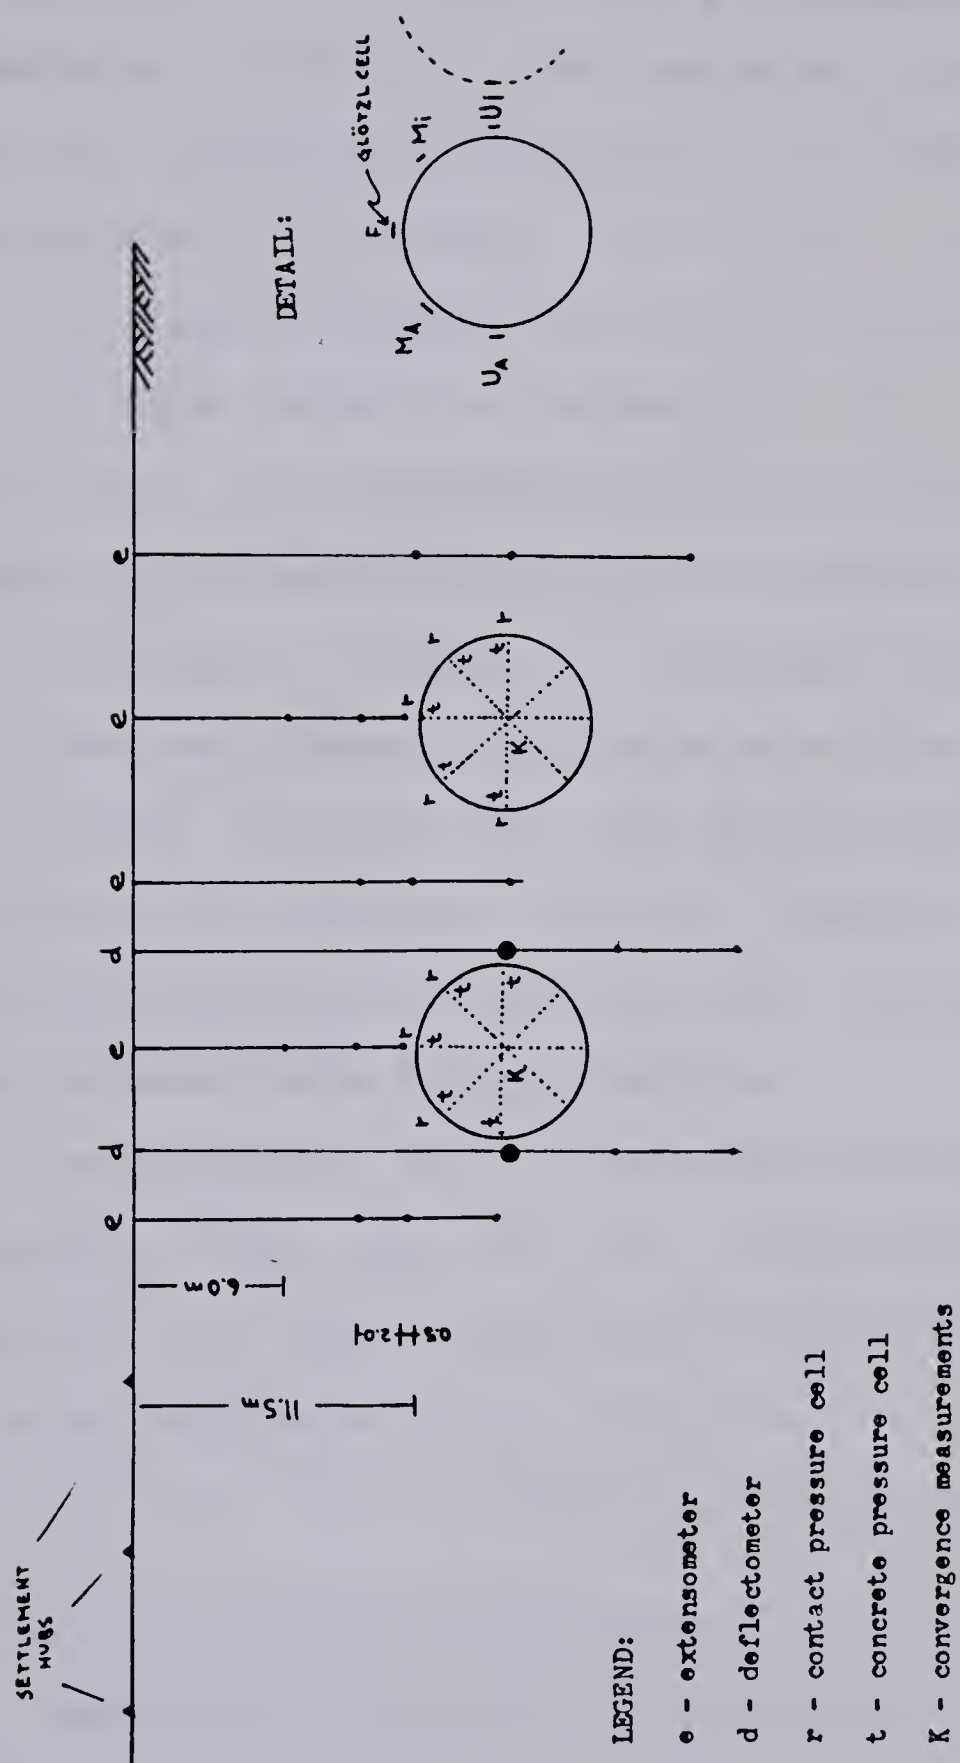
Typical monitoring layout - Frankfurt Baulos 25 experimental section
